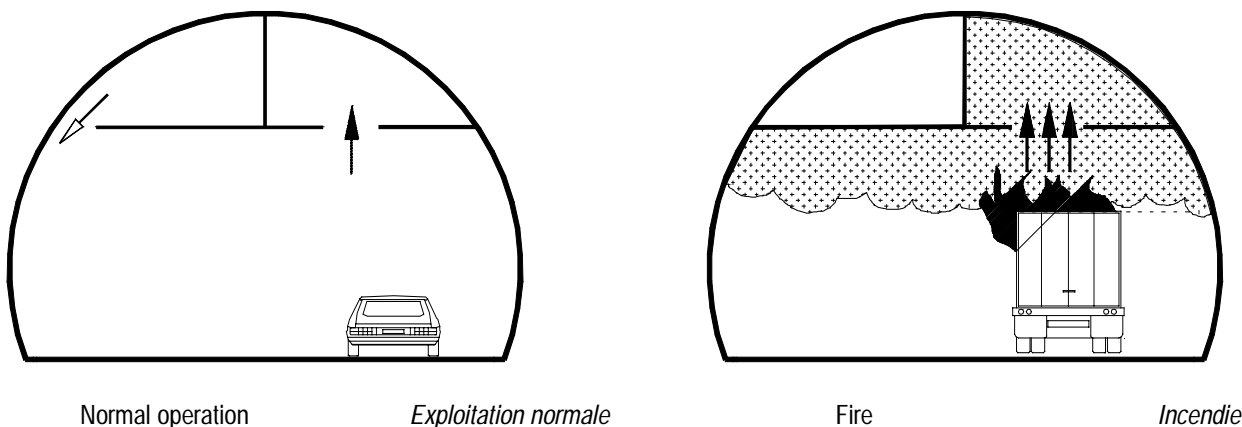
Example of a transverse ventilation system (without secondary supply ducts to pavement level)
